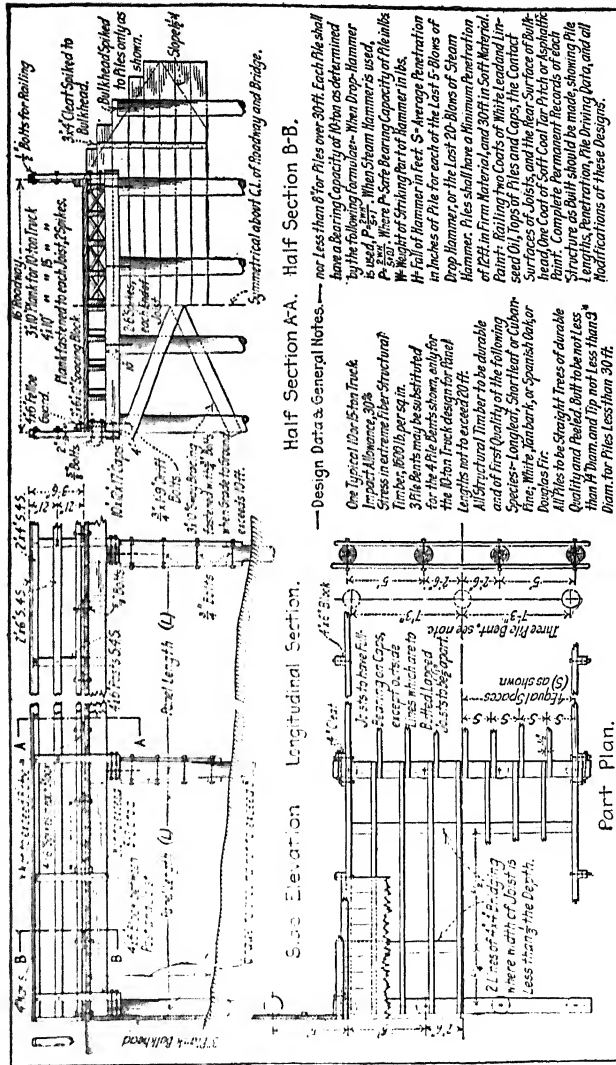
Typical Pile Trestle. U. S. Office of Public Roads.
